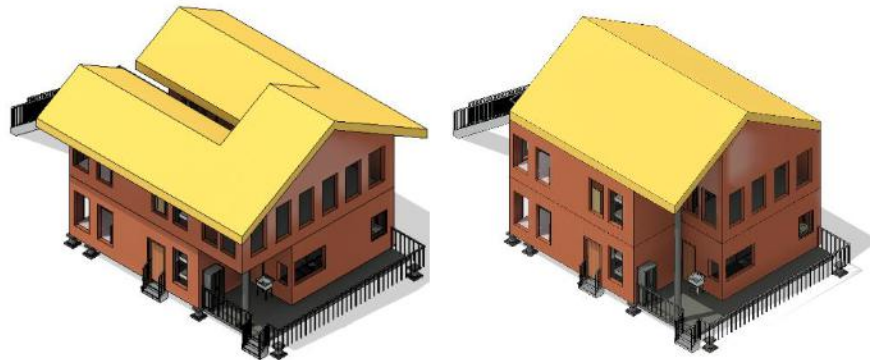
Roof of one large truss spanning the entirety of the dorm building with the walls connecting to the edge of the truss system.
